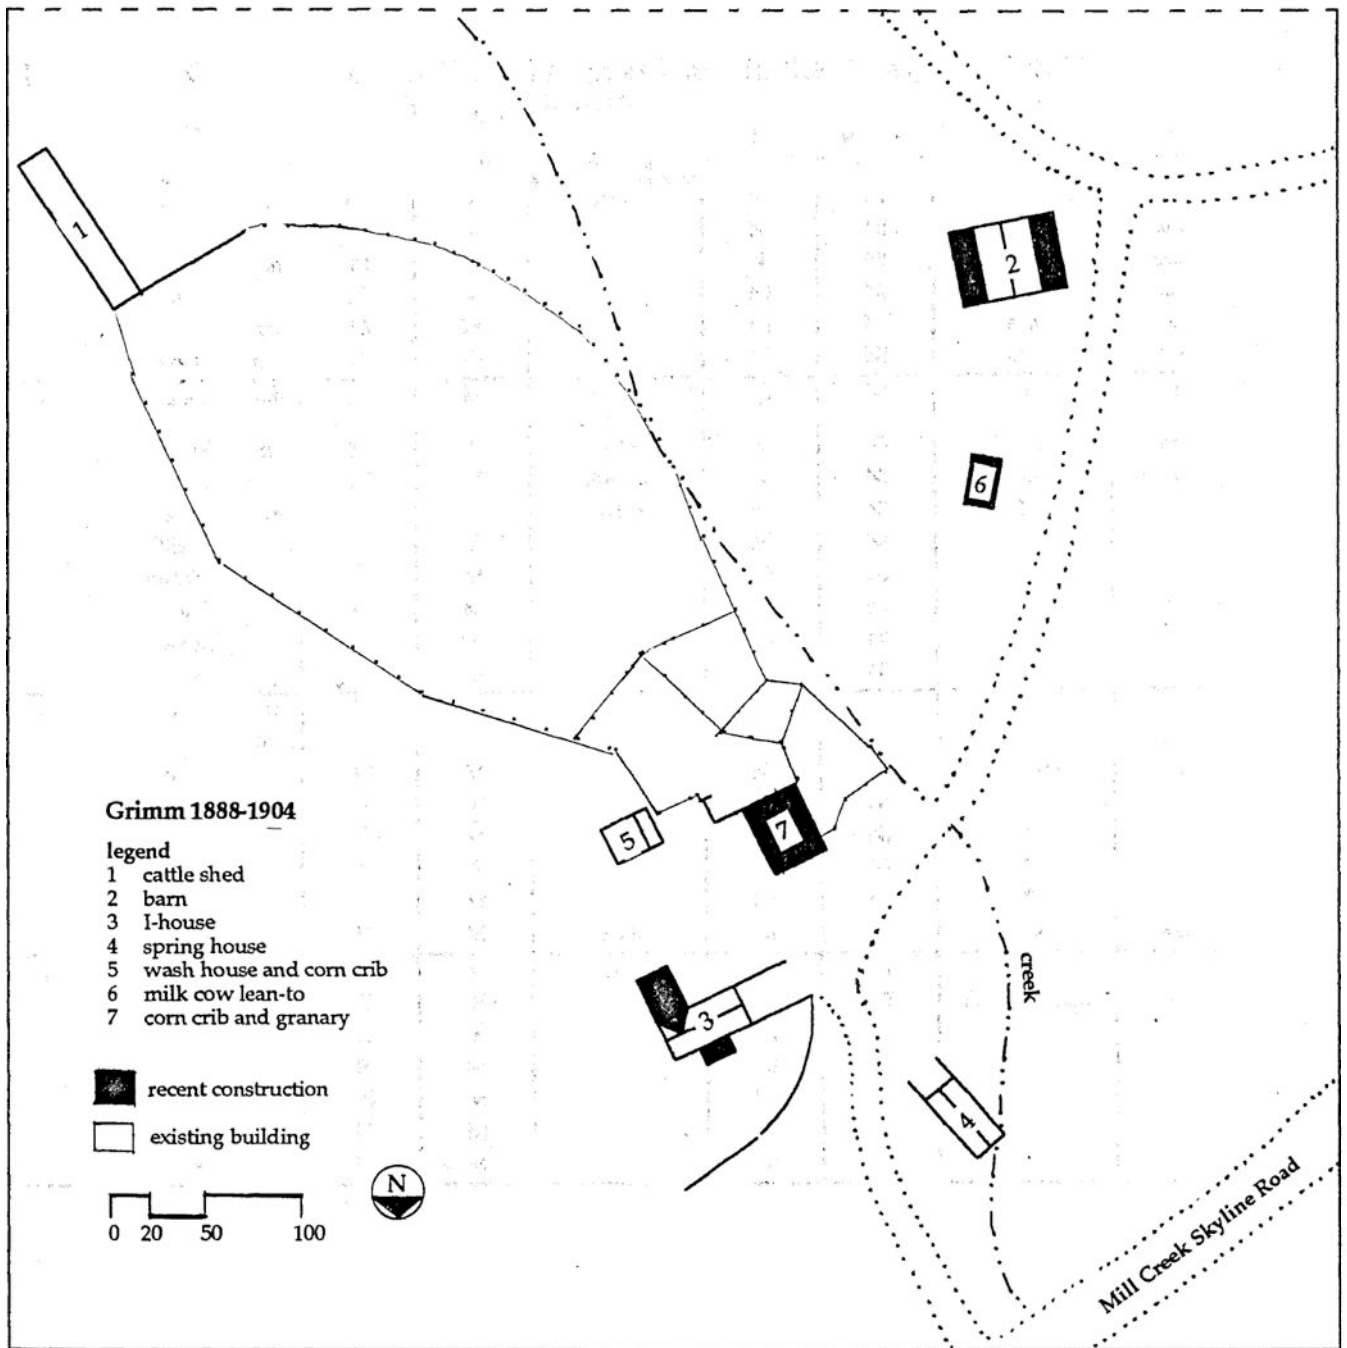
Site plan, Henry Grimm's I-house and outbuildings, 1888-1904
